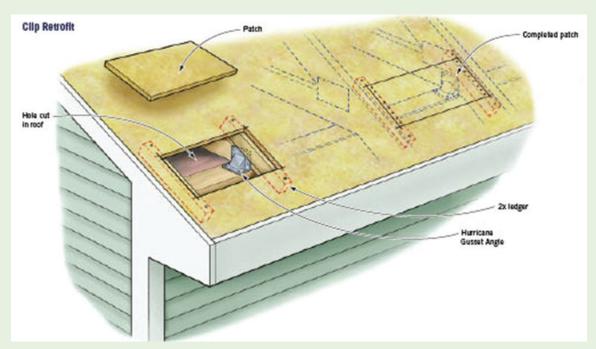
To install connectors with minimal demolition, cut rectangular holes between pairs of trusses. A connector can be attached to a truss on each side of the hole, allowing four trusses to be attached with just two holes. Holes are patched by resting the patch on scabs nailed to the sides of the trusses. Source: Coastal Contractors Online.
